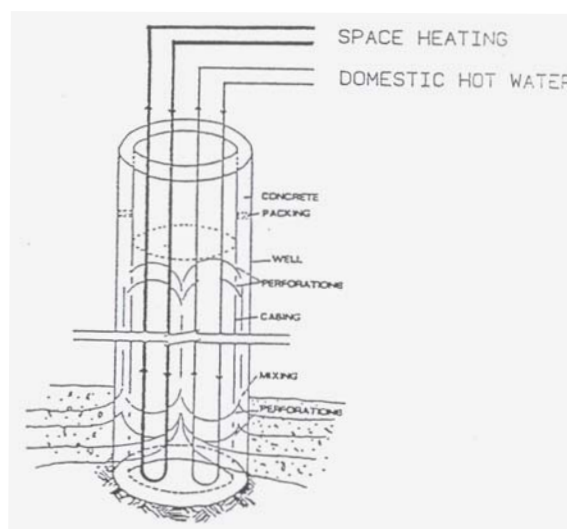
Typical DHE installation in a Klamath Falls well, Oregon USA (Culver and Reistad, 1978).
